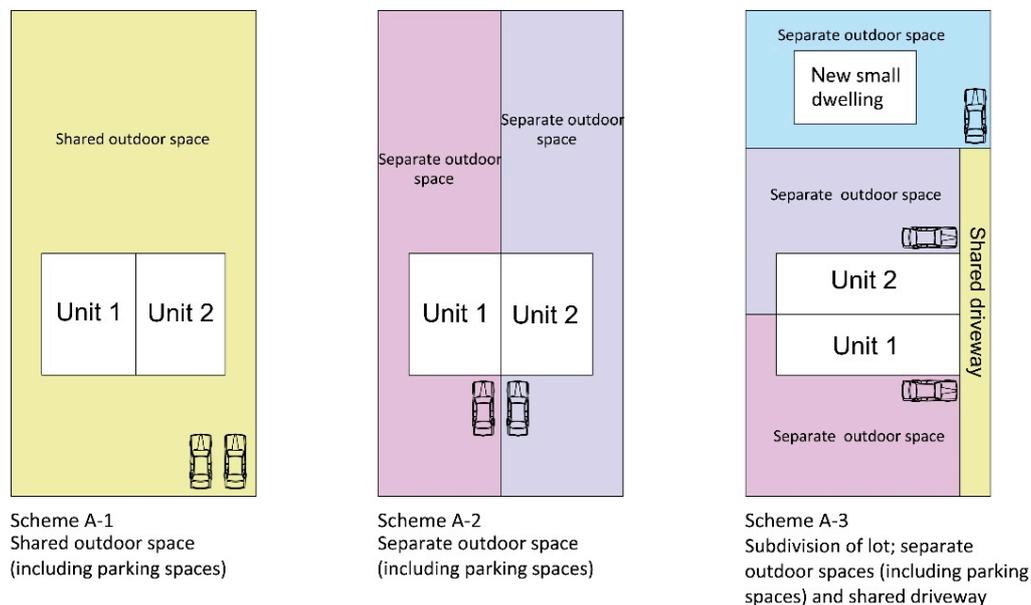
Scheme A - Subdivision of outdoor space and section (house plot)
